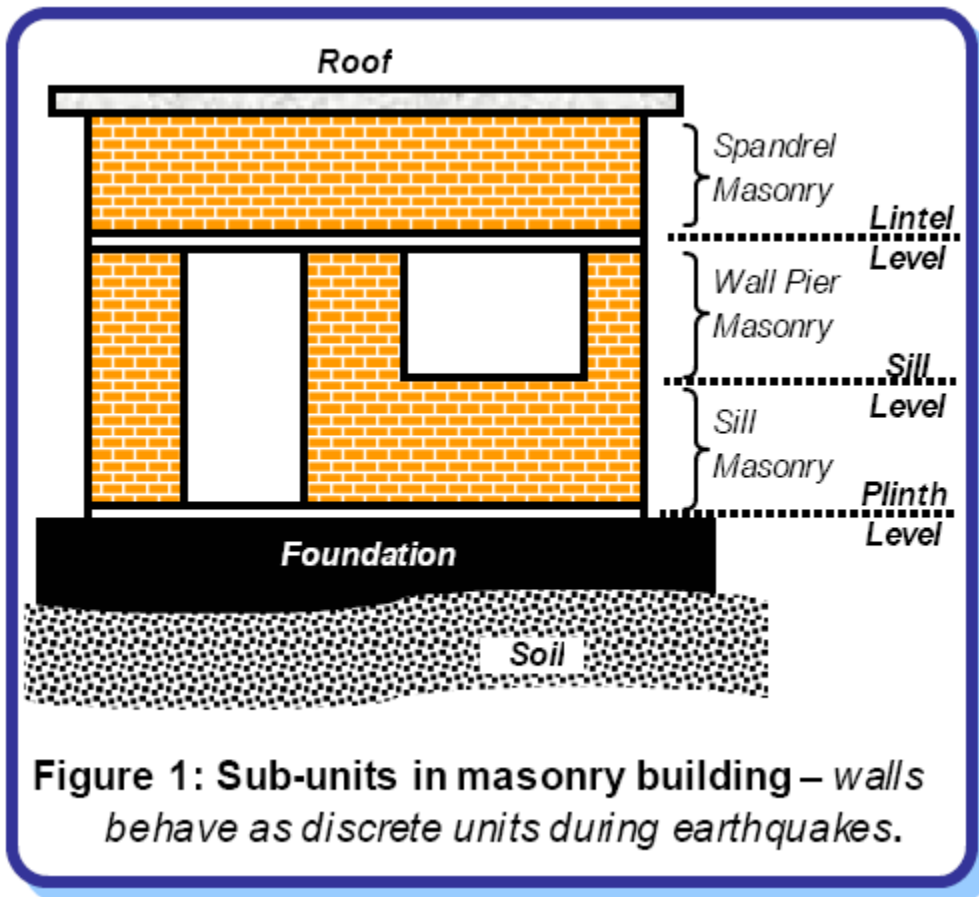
Sub-units in masonry building – walls behave as discrete units during earthquakes.
